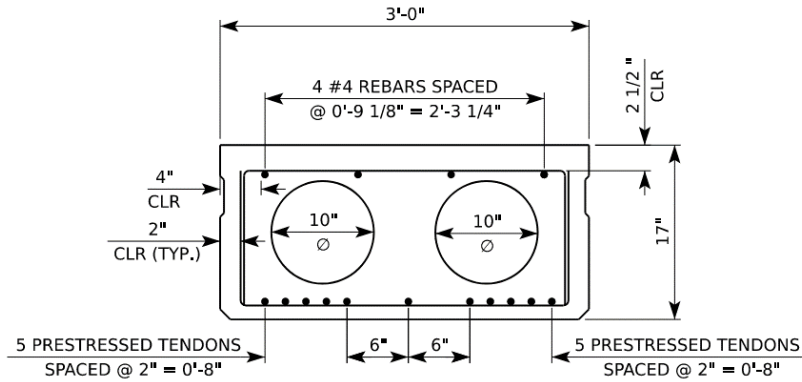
Cross-section of the experimentally tested prestressed concrete box beam.
